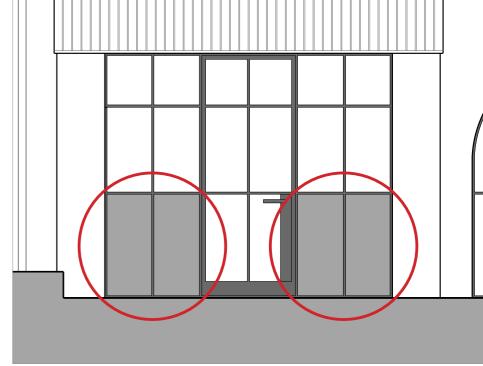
Detail 2: Ground Floor Bay (EL3)
